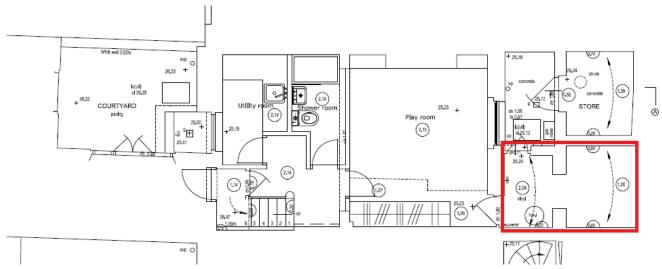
Extract from approved plan 99-111A identifying internal vault and boiler room
